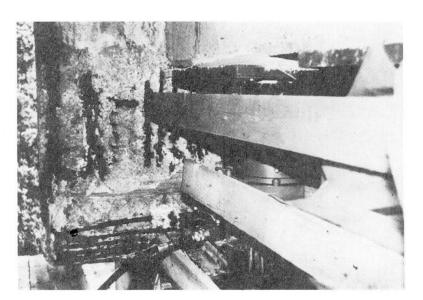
Jacks under cross-beam to relieve longitudinal girder during repair work (valley bridge Pfädchensgraben)
